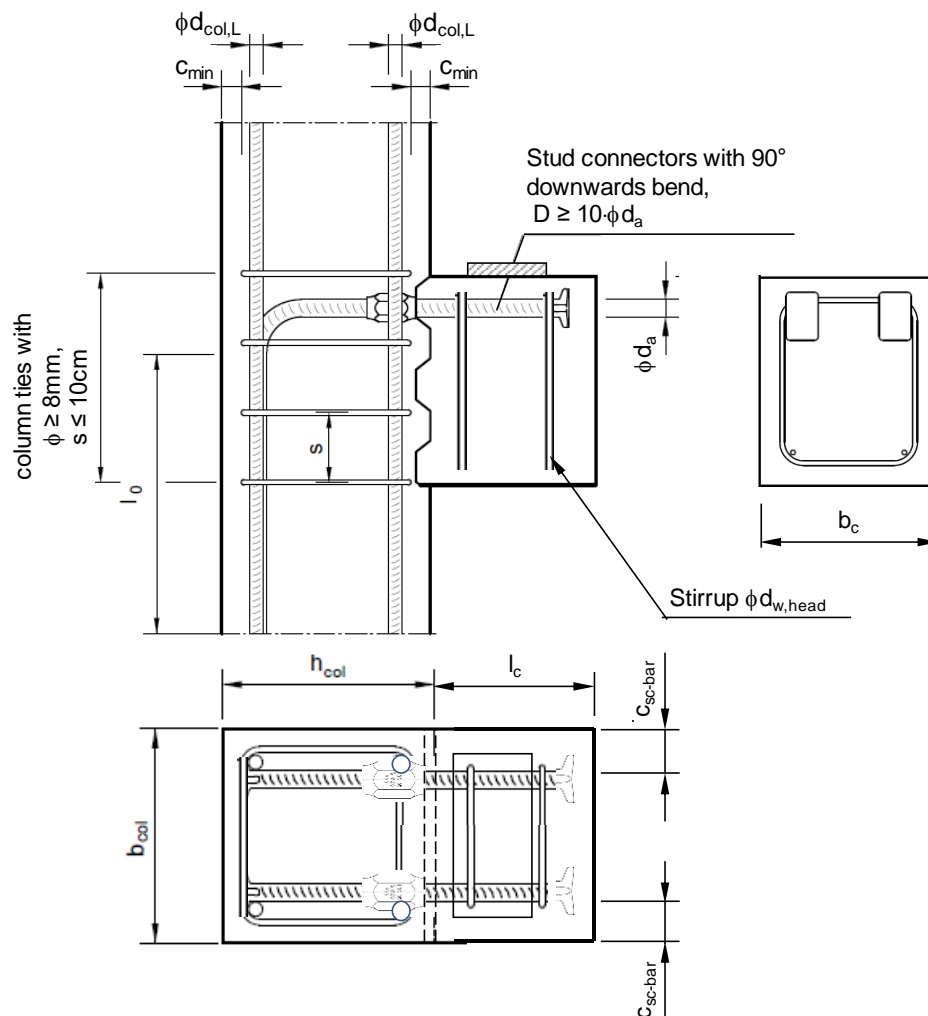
Anchorage of stud connectors bent downwards in the supporting column
